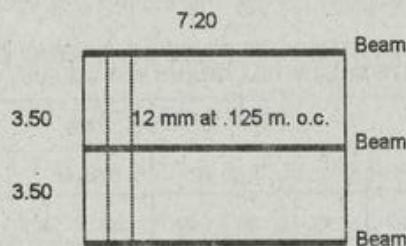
REINFORCED CONCRETE FLOOR PLAN
